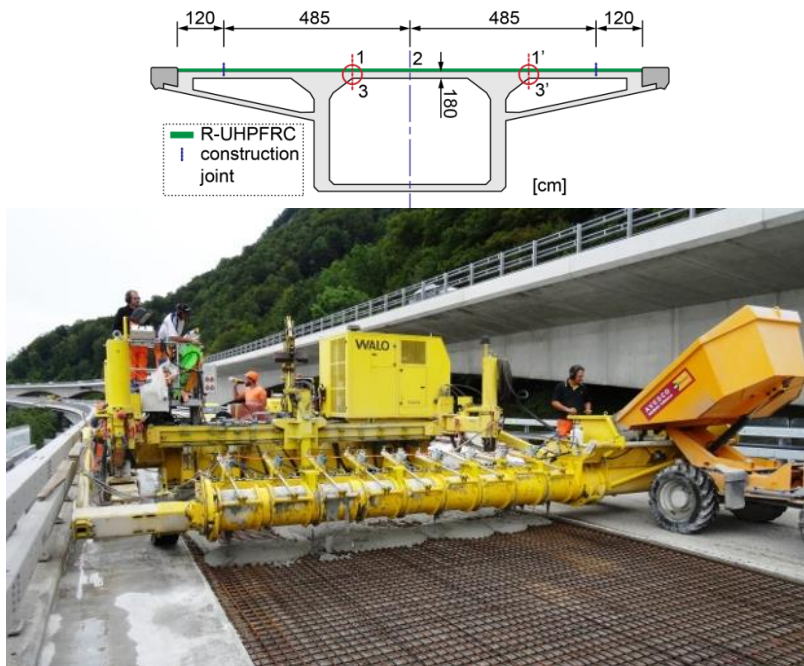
Chillon viaducts strengthening, adapted from; (a) box girders cross section and (b) UHPFRC casting machine (Masse and Br  heiler, 2016)
